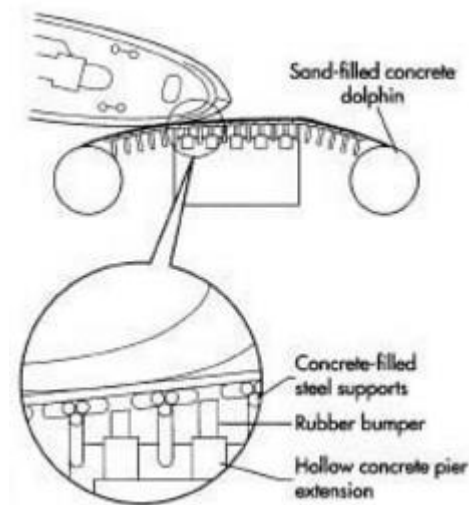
Example of fendering system (Hall, Unknown)
